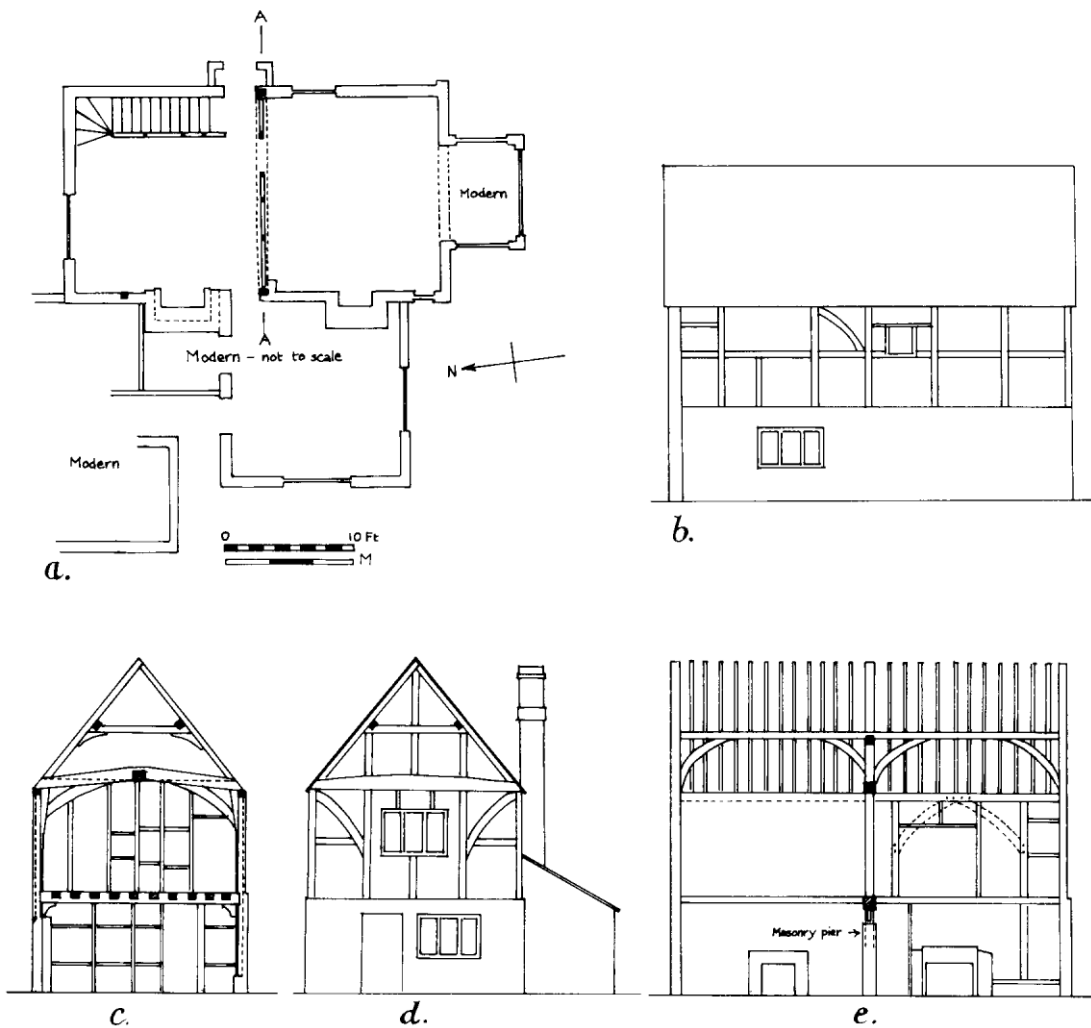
Stock Place, (a) Ground plan, (b) East elevation, 1912 (from a RCHM photograph), (c) Section at A-A, looking south, (d) North elevation, 1912 (from a RCHM photograph), (e) Cut-away view, looking west.
